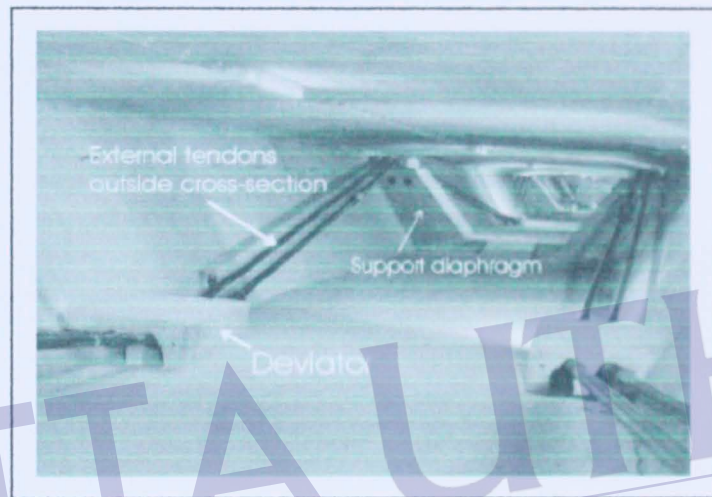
Box girder bridge with externally deflected tendons (mysite.wanadoo-members.co.uk/jens/thesis/1_externalPrestress.pdf, 2001)
